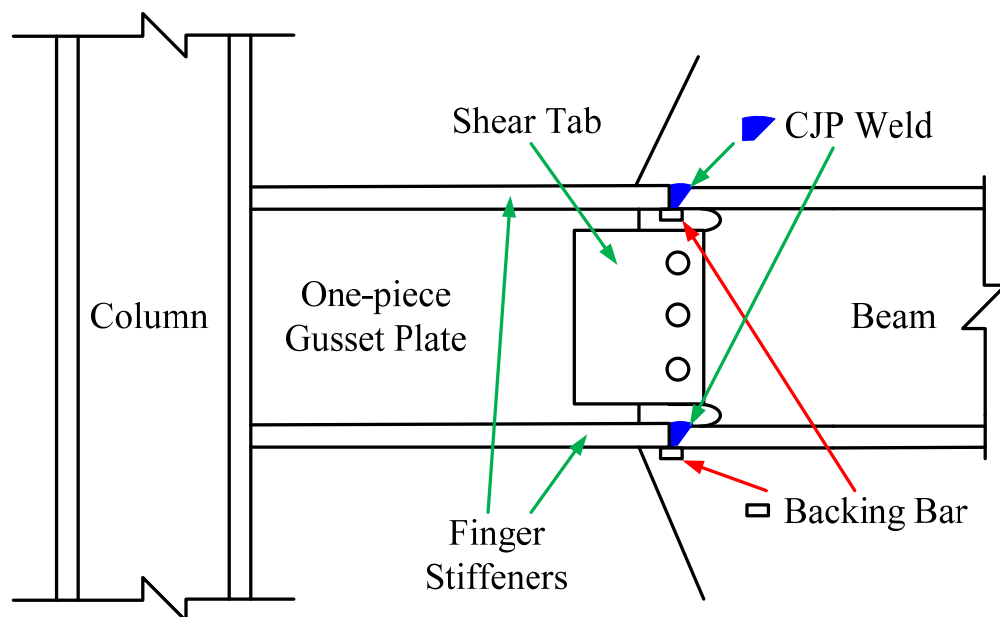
(b) Specimen TCBF-B-1: lower beam-to-gusset plate connection weld details.
